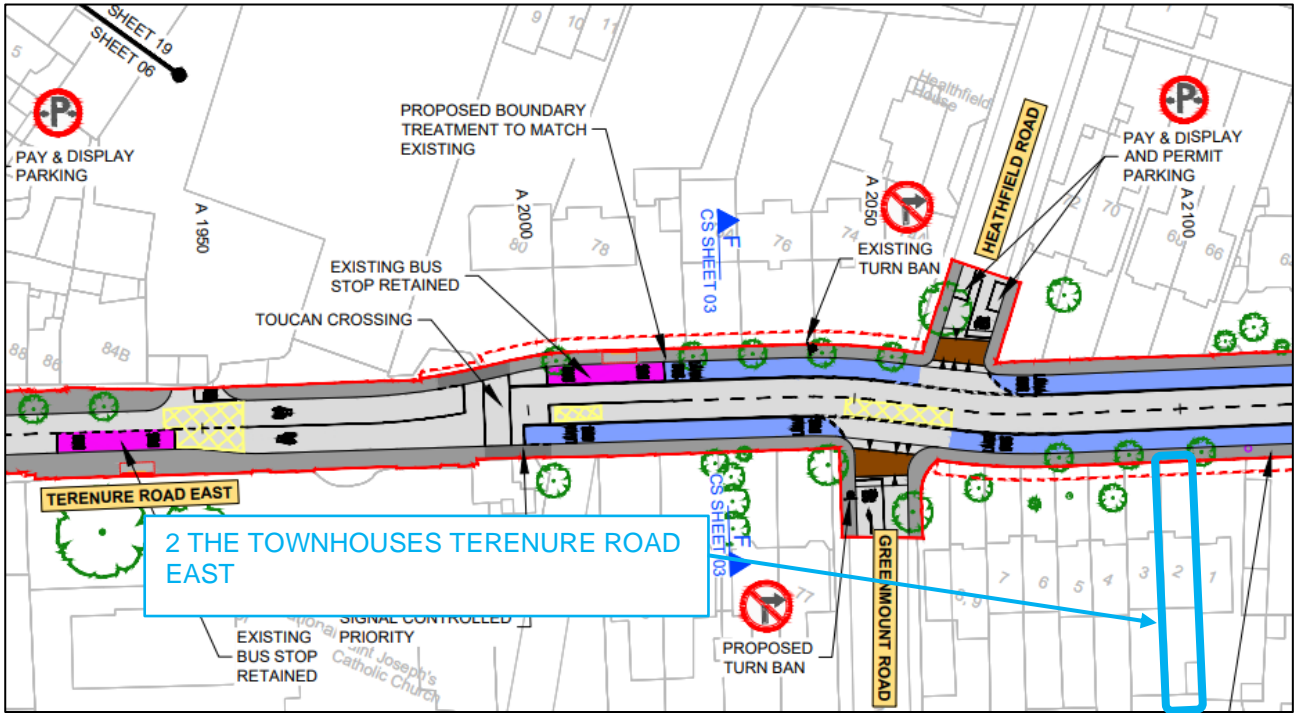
General Arrangement of Proposed Scheme adjacent to 2 The Townhouses Terenure Road East (Sheet 06)
